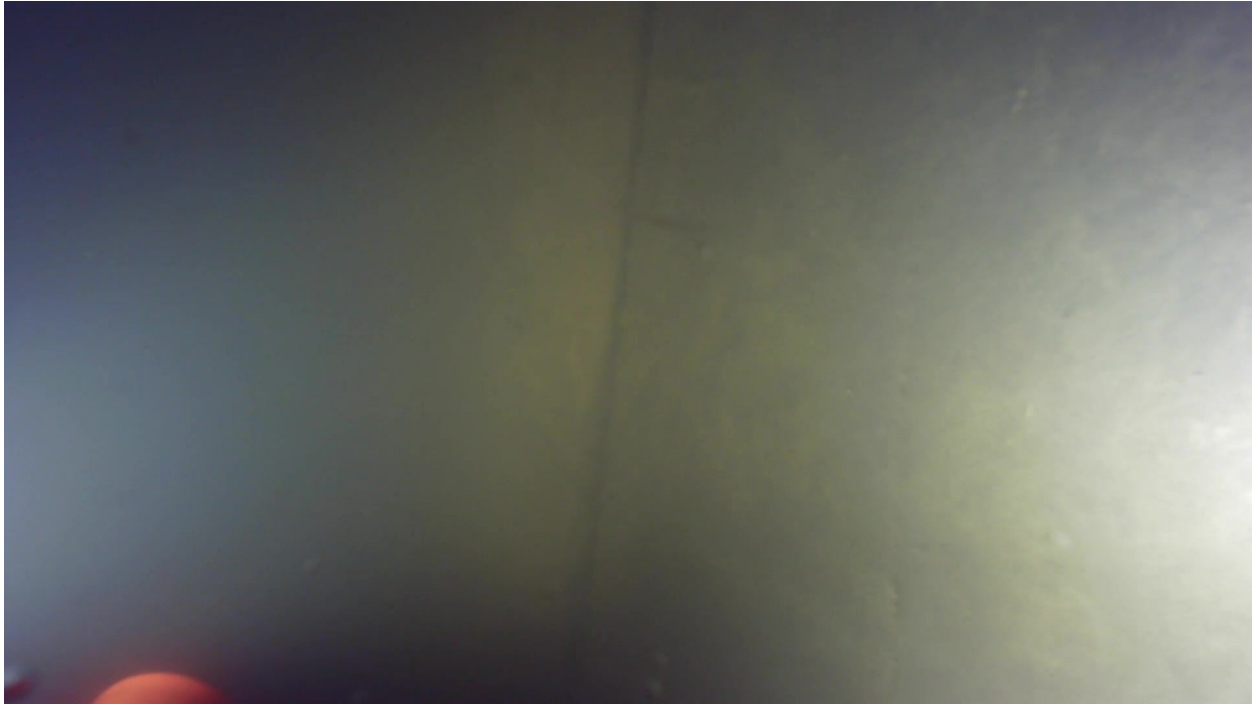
Typical vertical culvert section joint on wall with minimal gap and no offset
